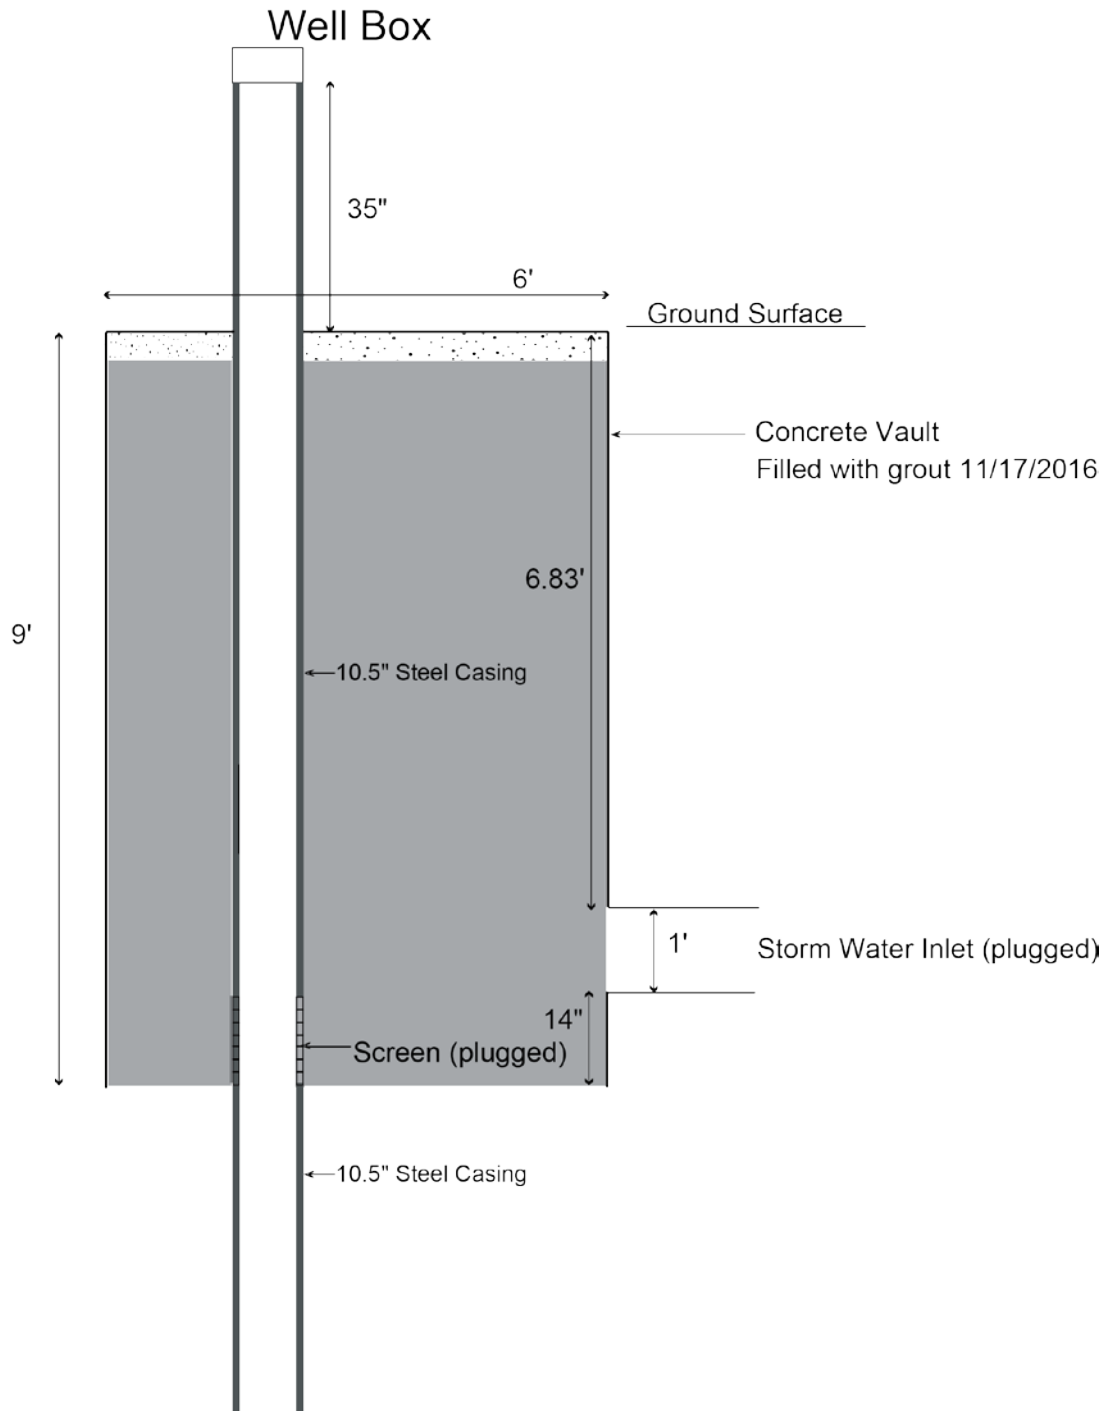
Construction diagram showing the grouting of the vault and blockage of the storm water inlet pipe of well TAN DRAINAGE DISP. 02
